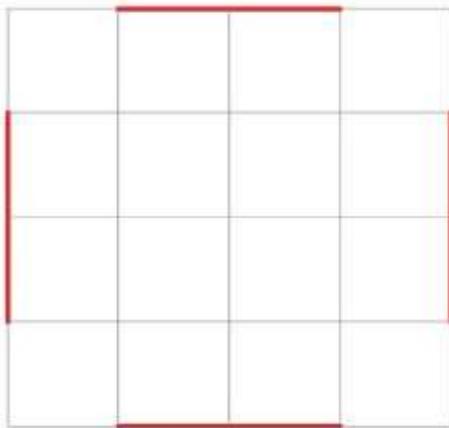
(a) Structural Plan for V-braced RC Frame (Model-6)
